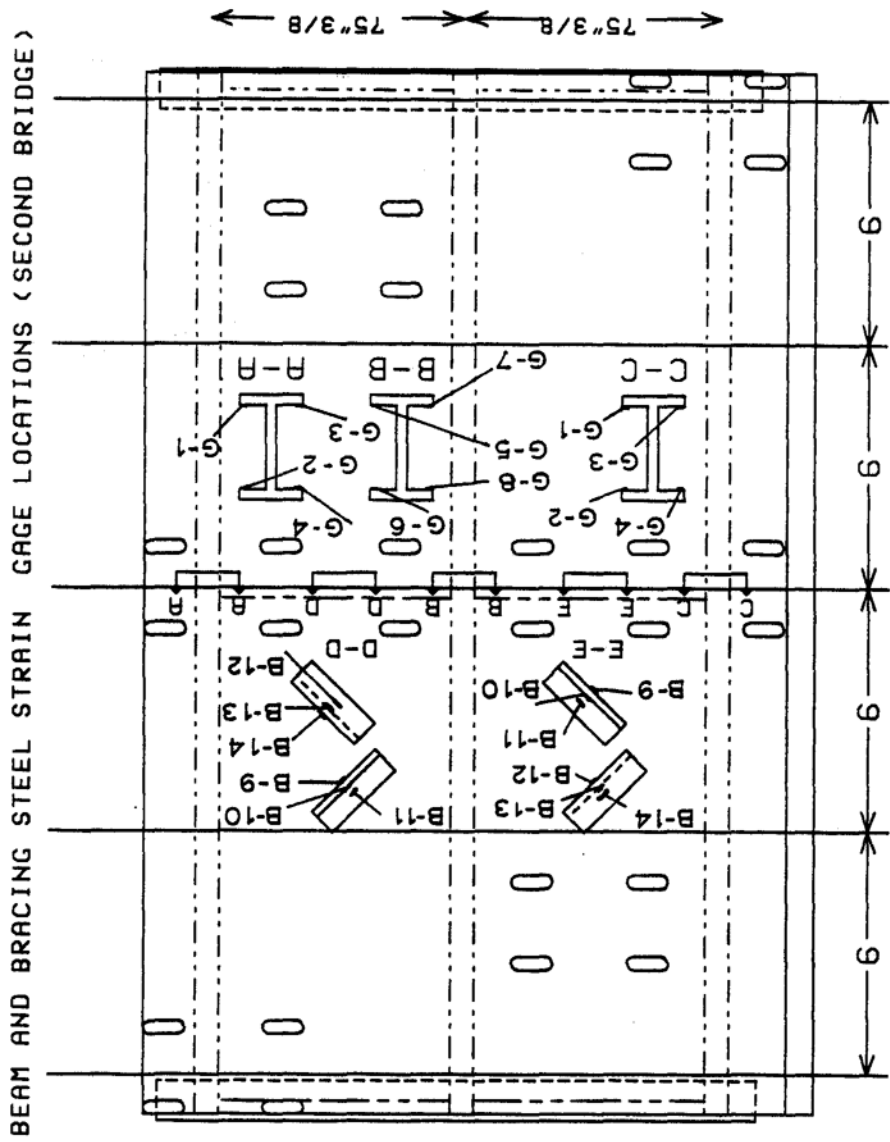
Beam and Bracing Steel Strain Gage Locations (Second Bridge)
